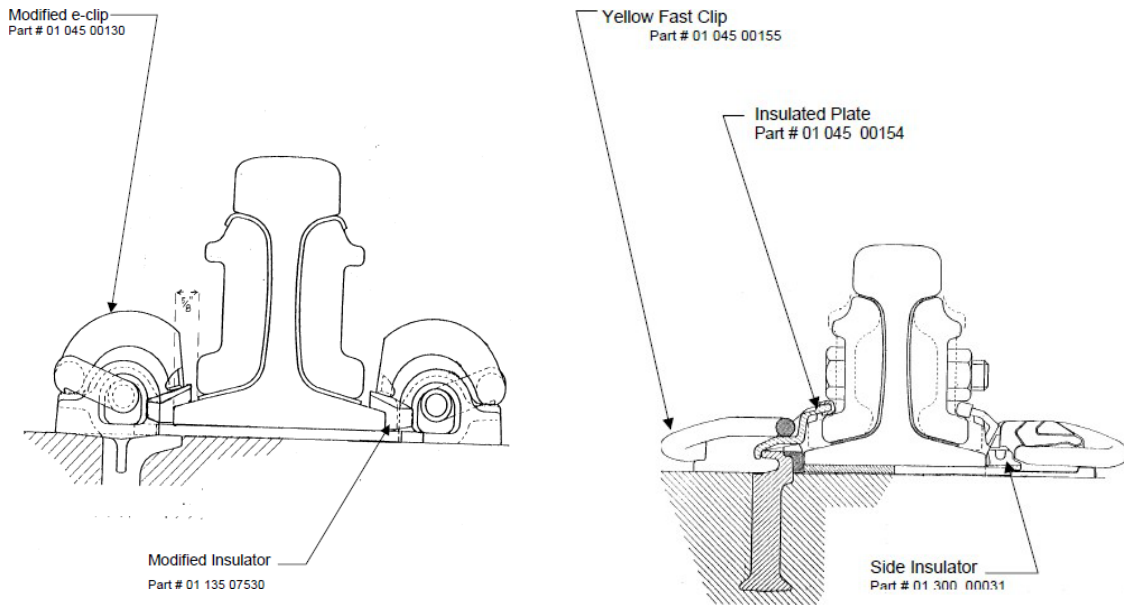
Concrete Tie Elastic Fasteners at Insulated Joints
